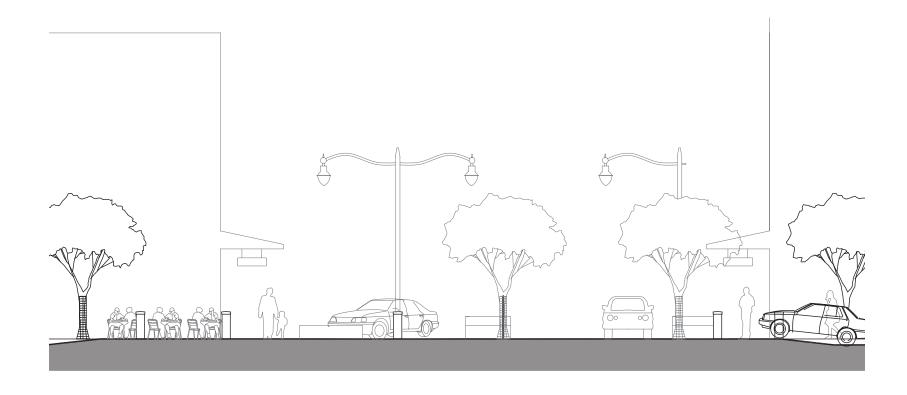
Raised Intersection Street Section Scale: 3/16"=1'-0"
